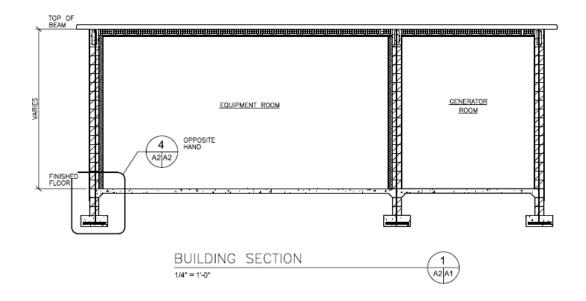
TYPICAL EQUIPMENT BUILDING LAYOUT - SIDE END ELEVATIONS
